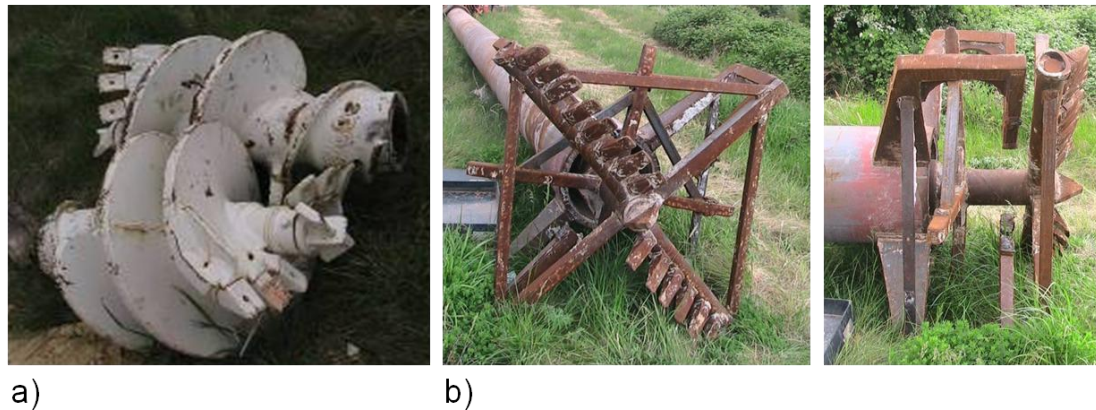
Single auger systems: (a) standard single auger system (b) double rotary head auger, after Al-Tabbaa et al. (2012)
